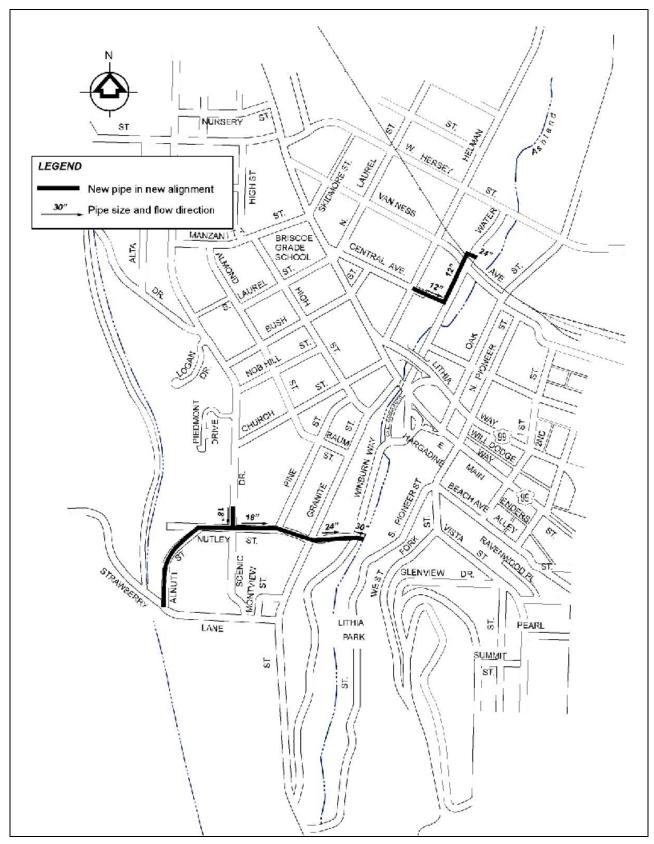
Recommended Improvements for Nutley Street and Central Avenue
